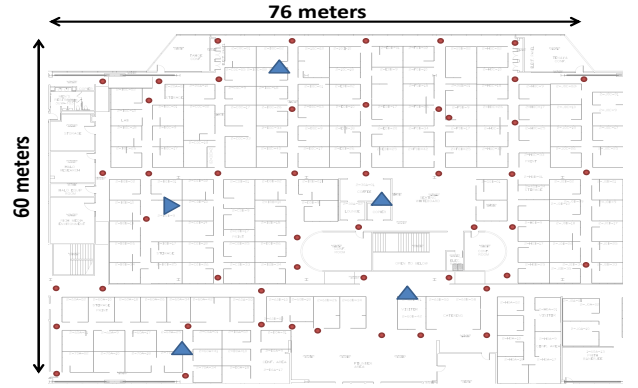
Floorplan of our office building. AP locations are shown as blue triangles, and markers as red circles.
